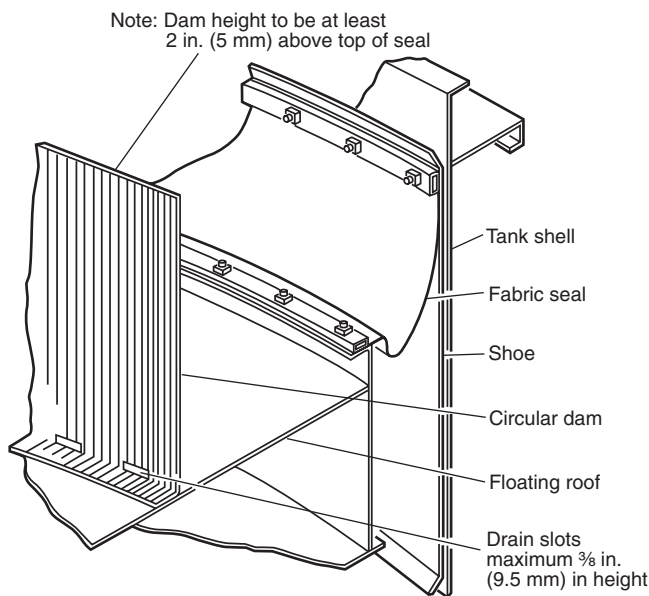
Typical foam dam for floating roof tank protection.
